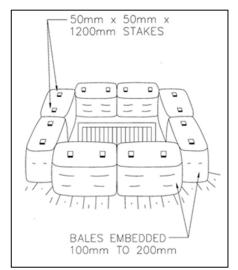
Stormwater Pit Sediment Trap (NTS)
